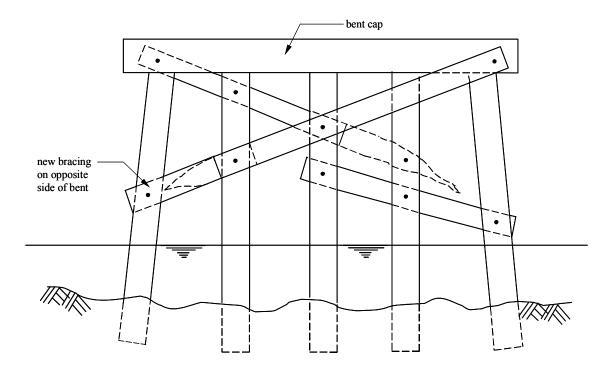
Installation and Repair of Timber Pile Sway Bracing.
